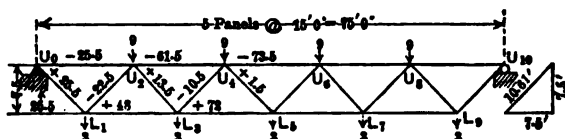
Dead Panel Loads and Index Stresses. Single-Track Deck Warren Truss Railroad Bridge.
